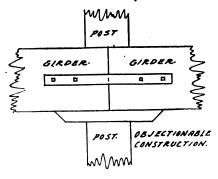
A common form of construction which is not good. No tie is provided between post and girders, which might prove disastrous in case of settlement due to insufficient footing or shock
